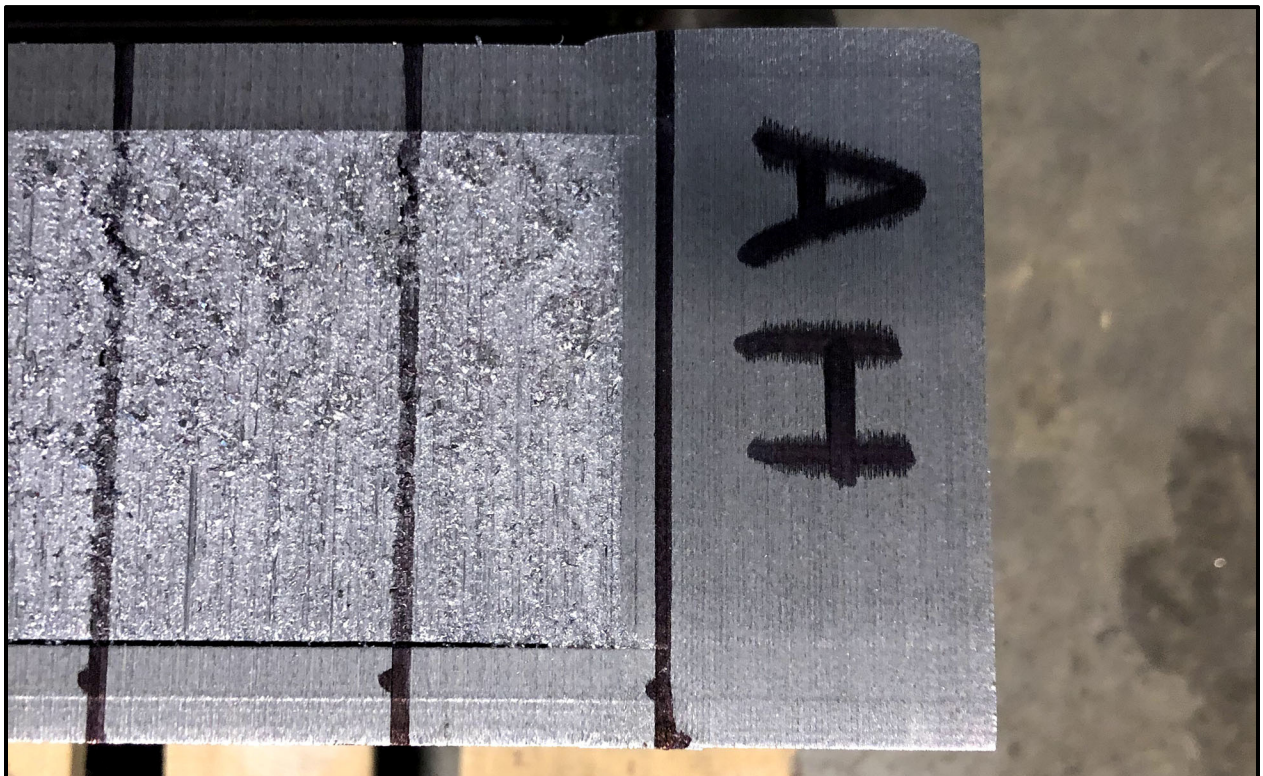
SC-30G3 18TU-04 Destructive Disassembly Cut AH at Upper Flange
